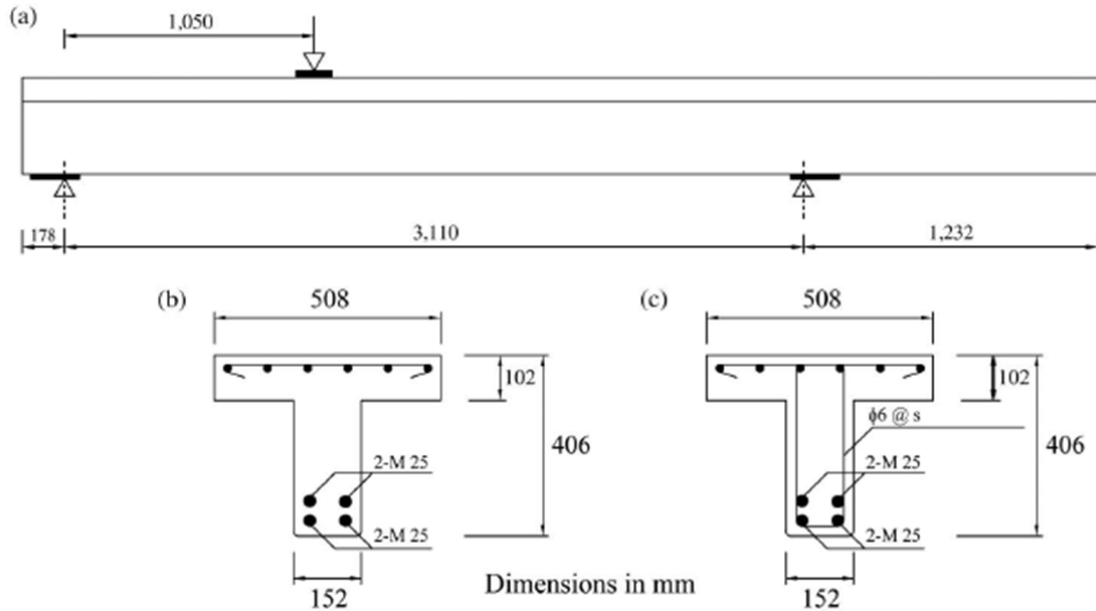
Details of tested beams: (a) longitudinal view; (b) cross-section with no transverse reinforcement; (c) cross-section with transverse steel stirrups (dimensions in mm) (Chaallal et al. 2011)
